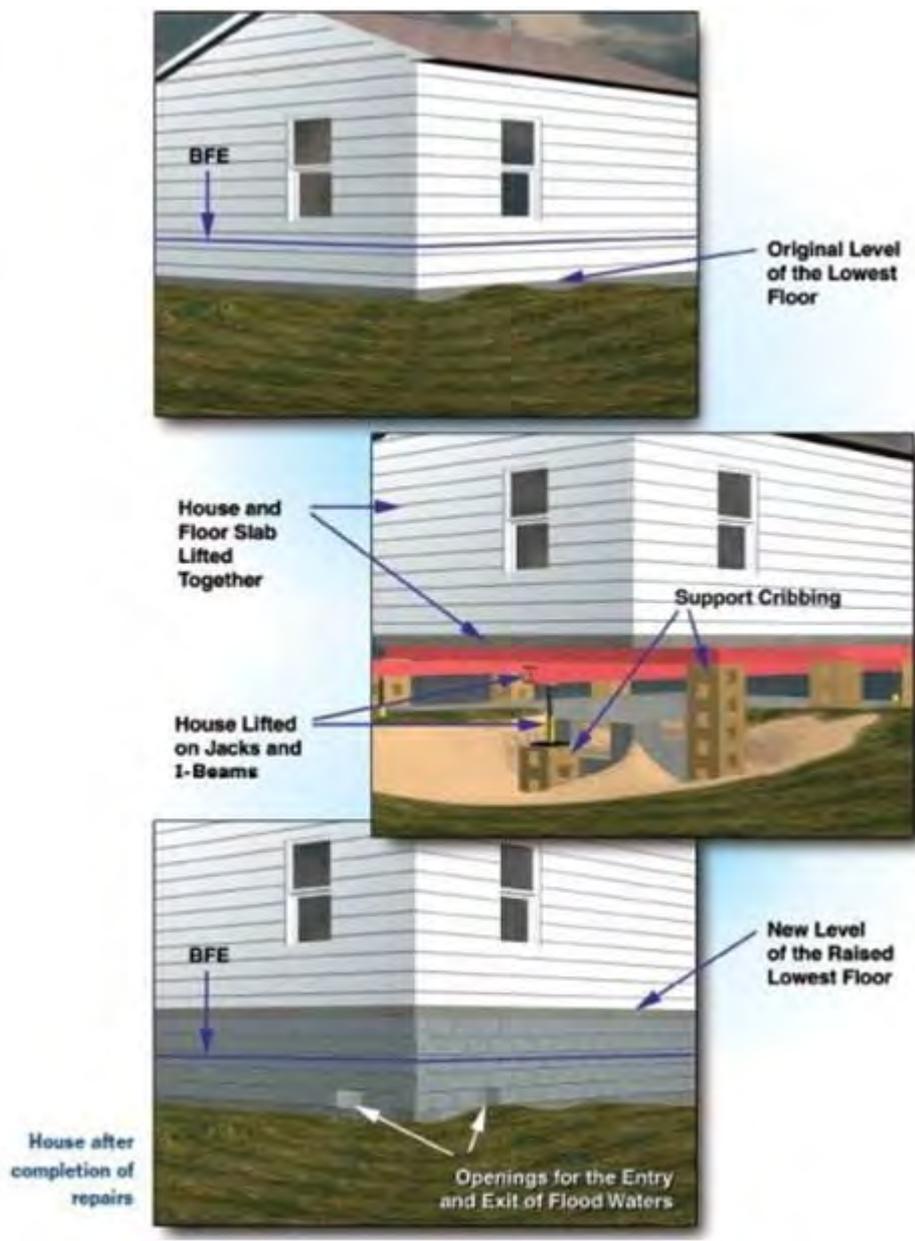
TECHNIQUES FOR ELEVATION (FEMA, 2000)
